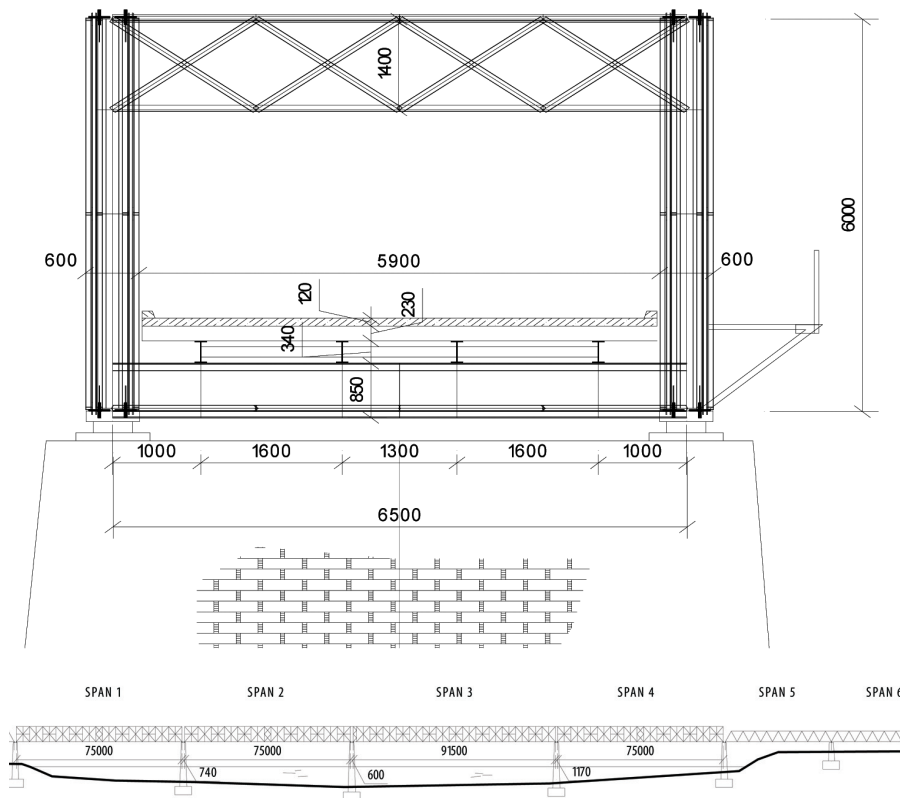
Cross section and schematic view of the Old Bridge over the Danube in Bratislava
